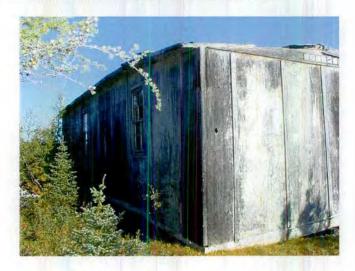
Aerial view of Site 321A before (September 8, 2000) and after clean-up (September 11, 2000). View behind building where the foundation has collapsed.
